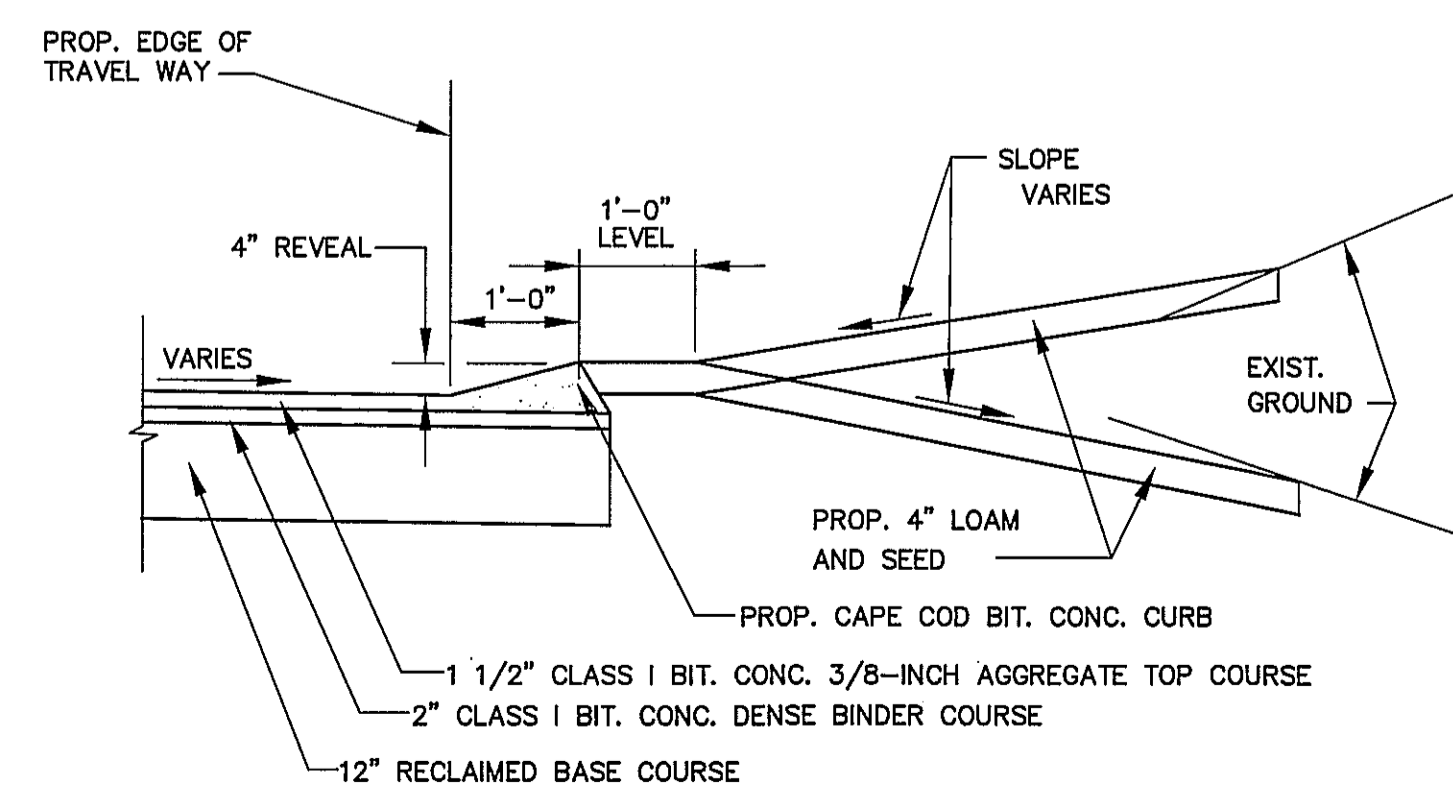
DETAIL FOR DRIVEWAY WITHOUT SIDEWALK
